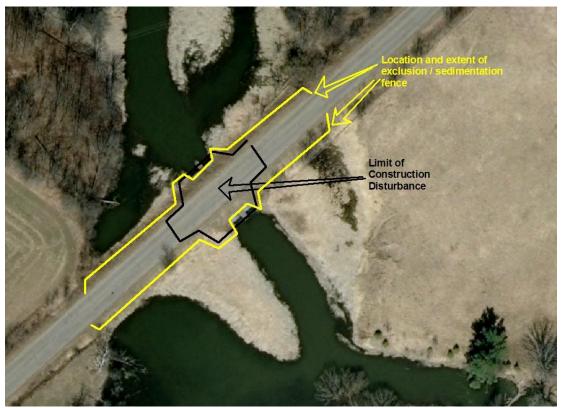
For larger culvert replacement projects exclusion fencing should extend a minimum of 20 meters from the limit of construction disturbance. Note the 4 locations where turtles could potentially enter the work site. Inspecting work area every morning is important
